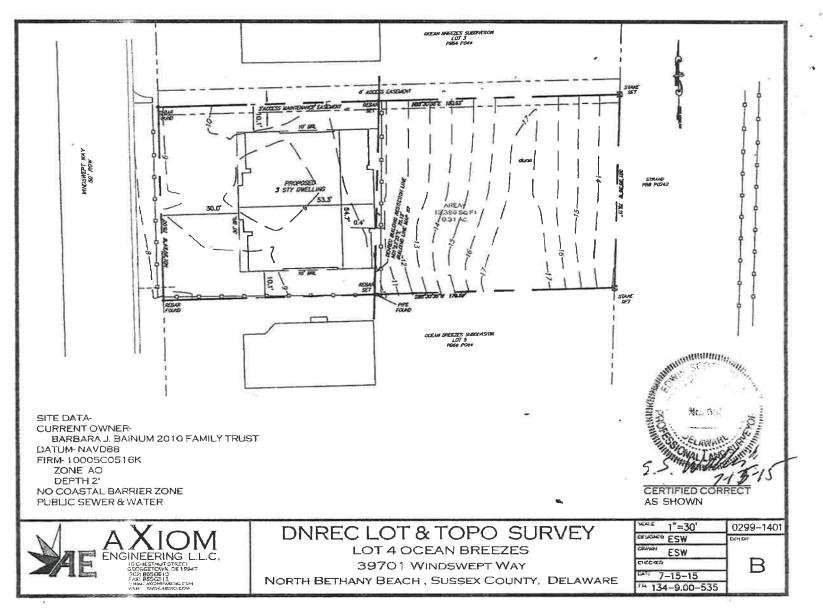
Plan view survey (prepared by Axiom Engineering, L.L.C.) showing "footprint" of proposed dwelling, topographic contours at 1' intervals, and DNREC Building Line. Entire structure will be located landward of Building Line.
